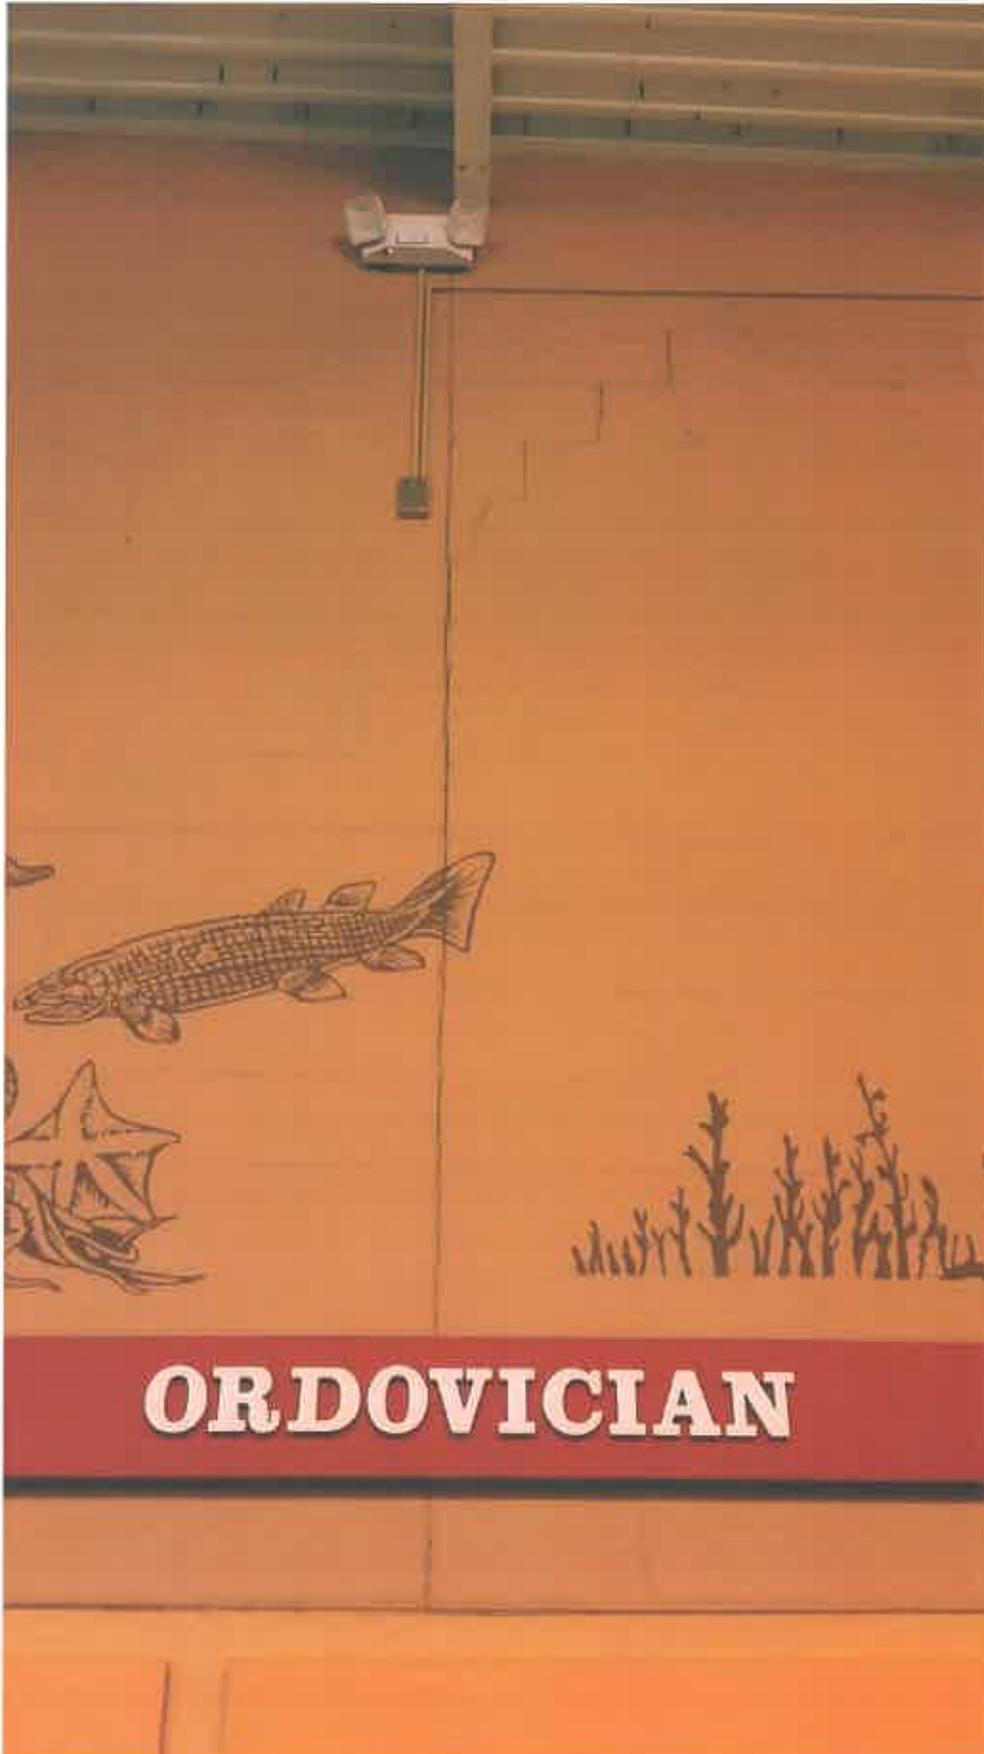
Crack In Interior Wall – Robinson Hall Of Earth And Man
